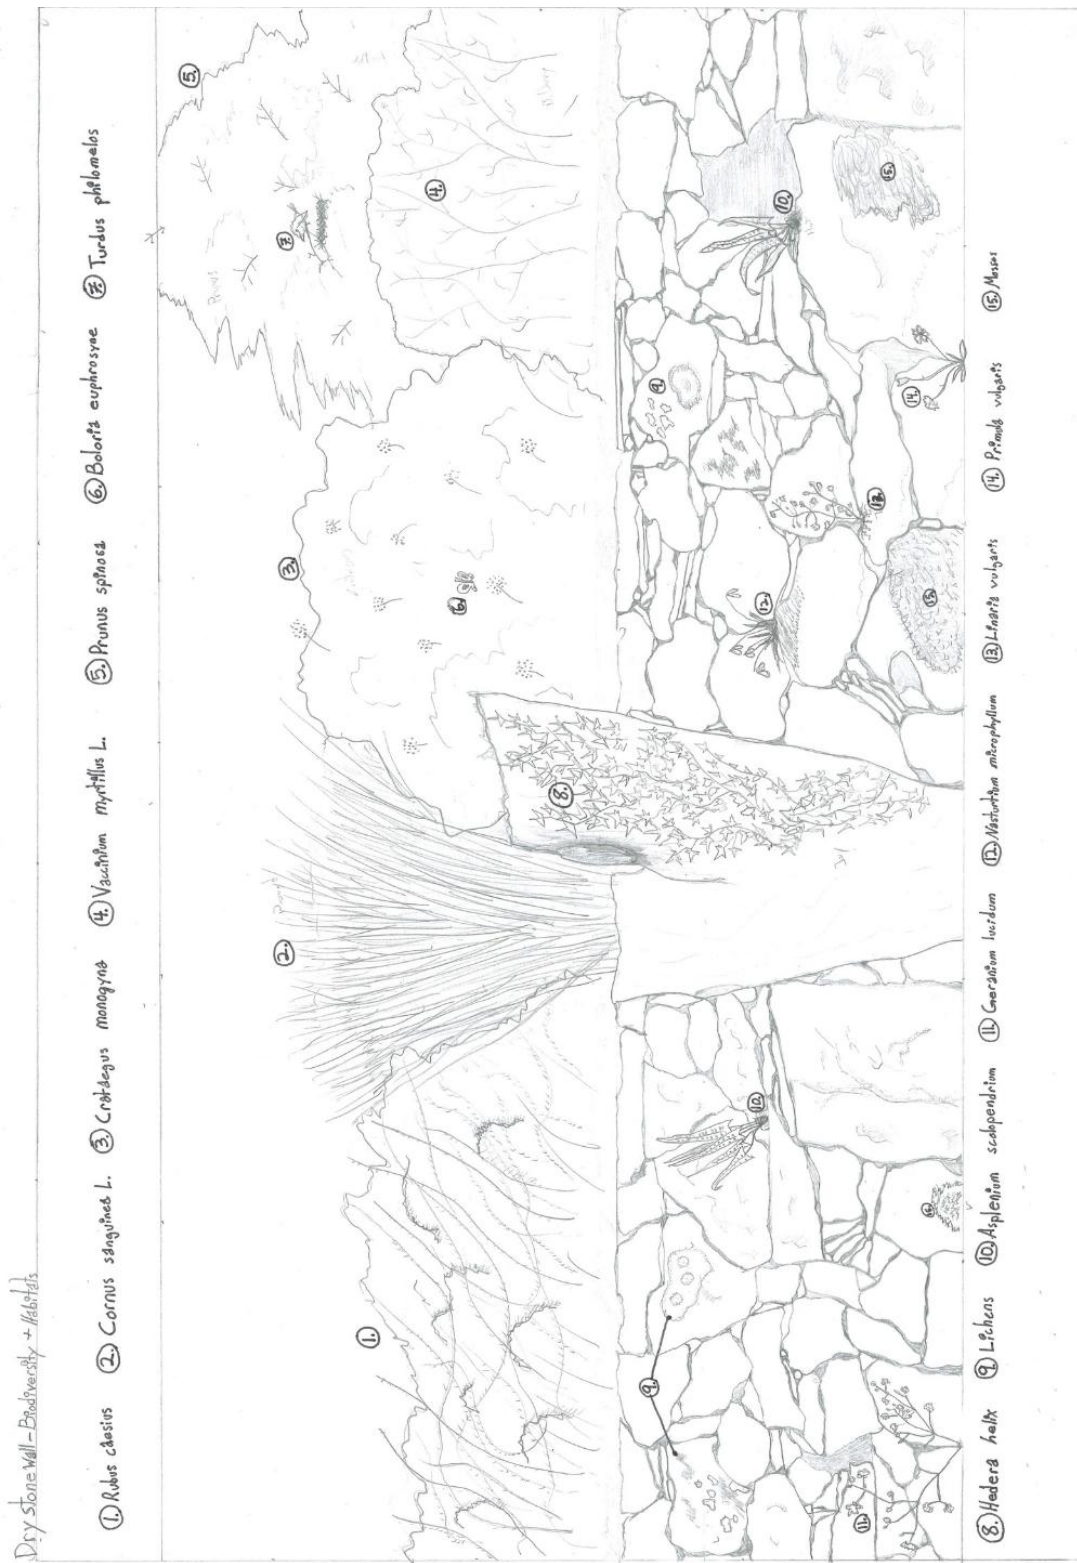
Dry stone wall structure and biodiversity. Scale 1:16 (at A3) (sketched by author, 2026).
